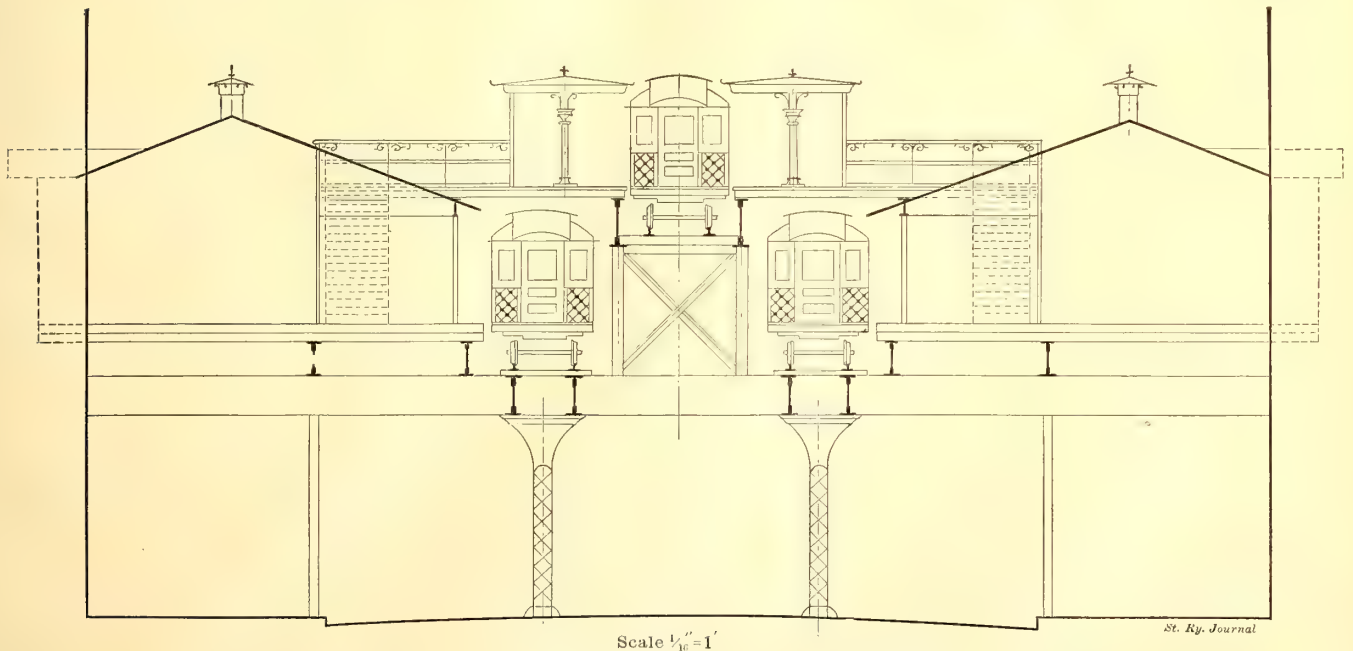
SECTION SHOWING PROPOSED EXPRESS STATION IN MANHATTAN BOROUGH
